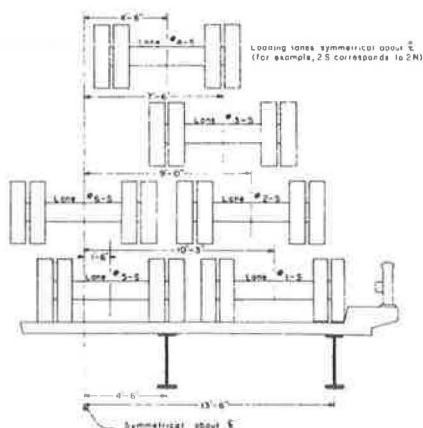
Cross-section showing test "lanes" for the steel stringer bridge.
